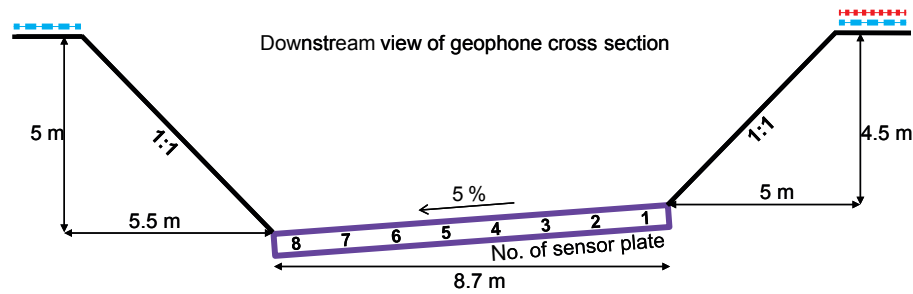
Schematic stream cross section at the geophone measuring site in both Fischbach and Ruetz. The steel–concrete pillar is located downstream of sensor plate 5. The sill with the steel plates is inclined towards the left bank to improve the resolution of the flow gauge measurements at low discharges. On the banks, the dotted horizontal line indicates the paved local road on the river’s right side at the Fischbach, and the two dashed horizontal lines indicate the gravelled parking lot on both river sides at the Ruetz.
